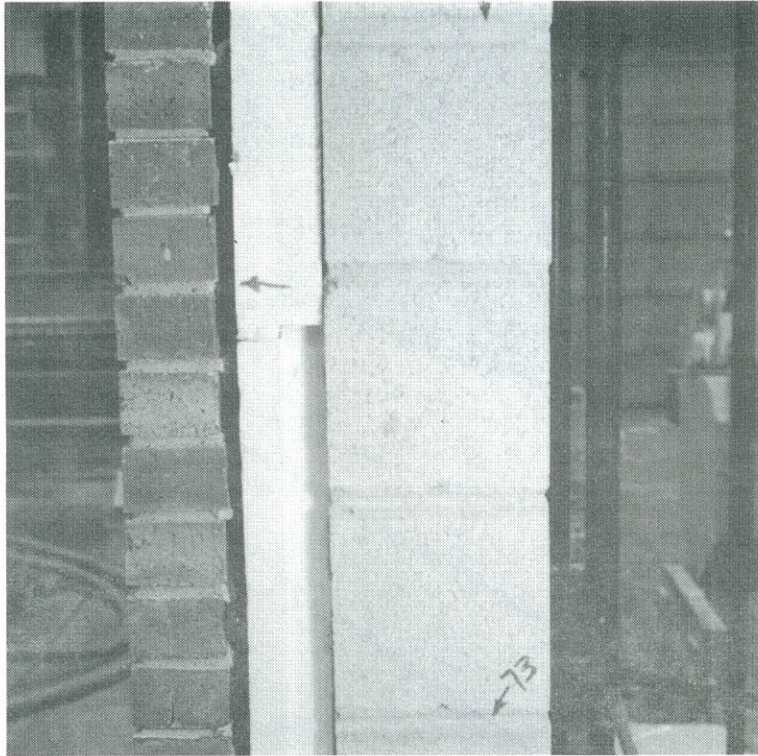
Tensile Failure in Block Mortar Joint of Wall #2
